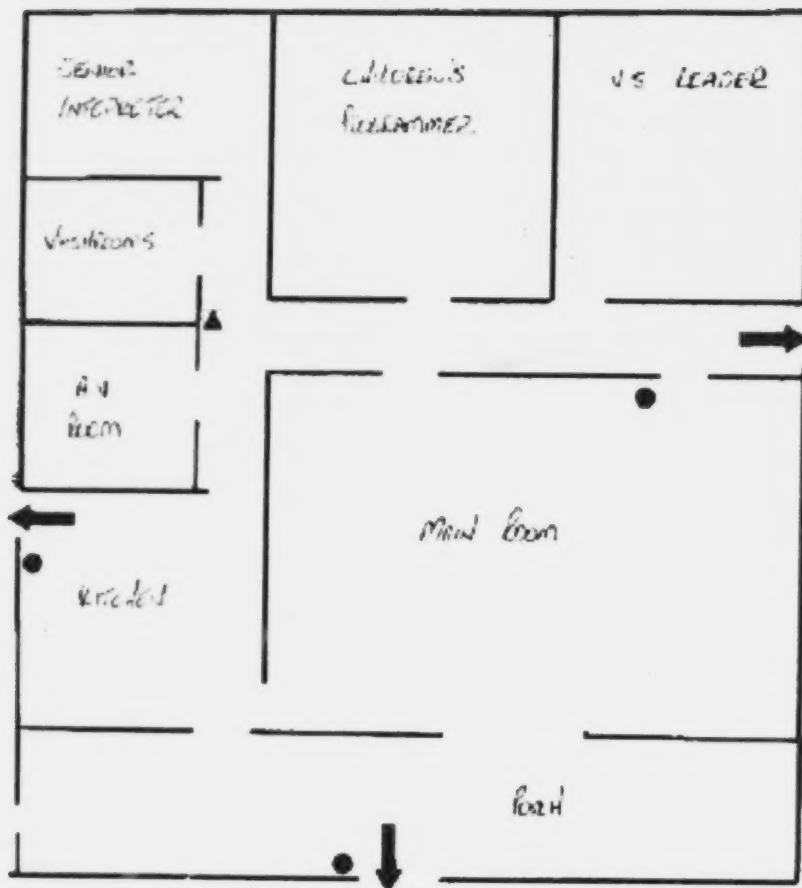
DENSON COTTAGE GROUND FLOOR PLAN
